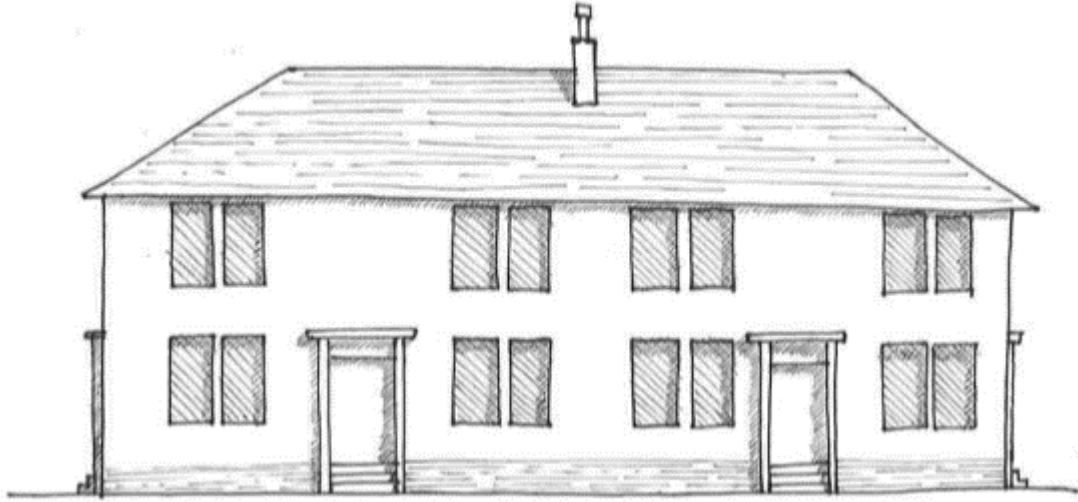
A typical four-in-a-block cottage as found in Piersland Park Conservation Area, with rectangular plan and hipped roof.
